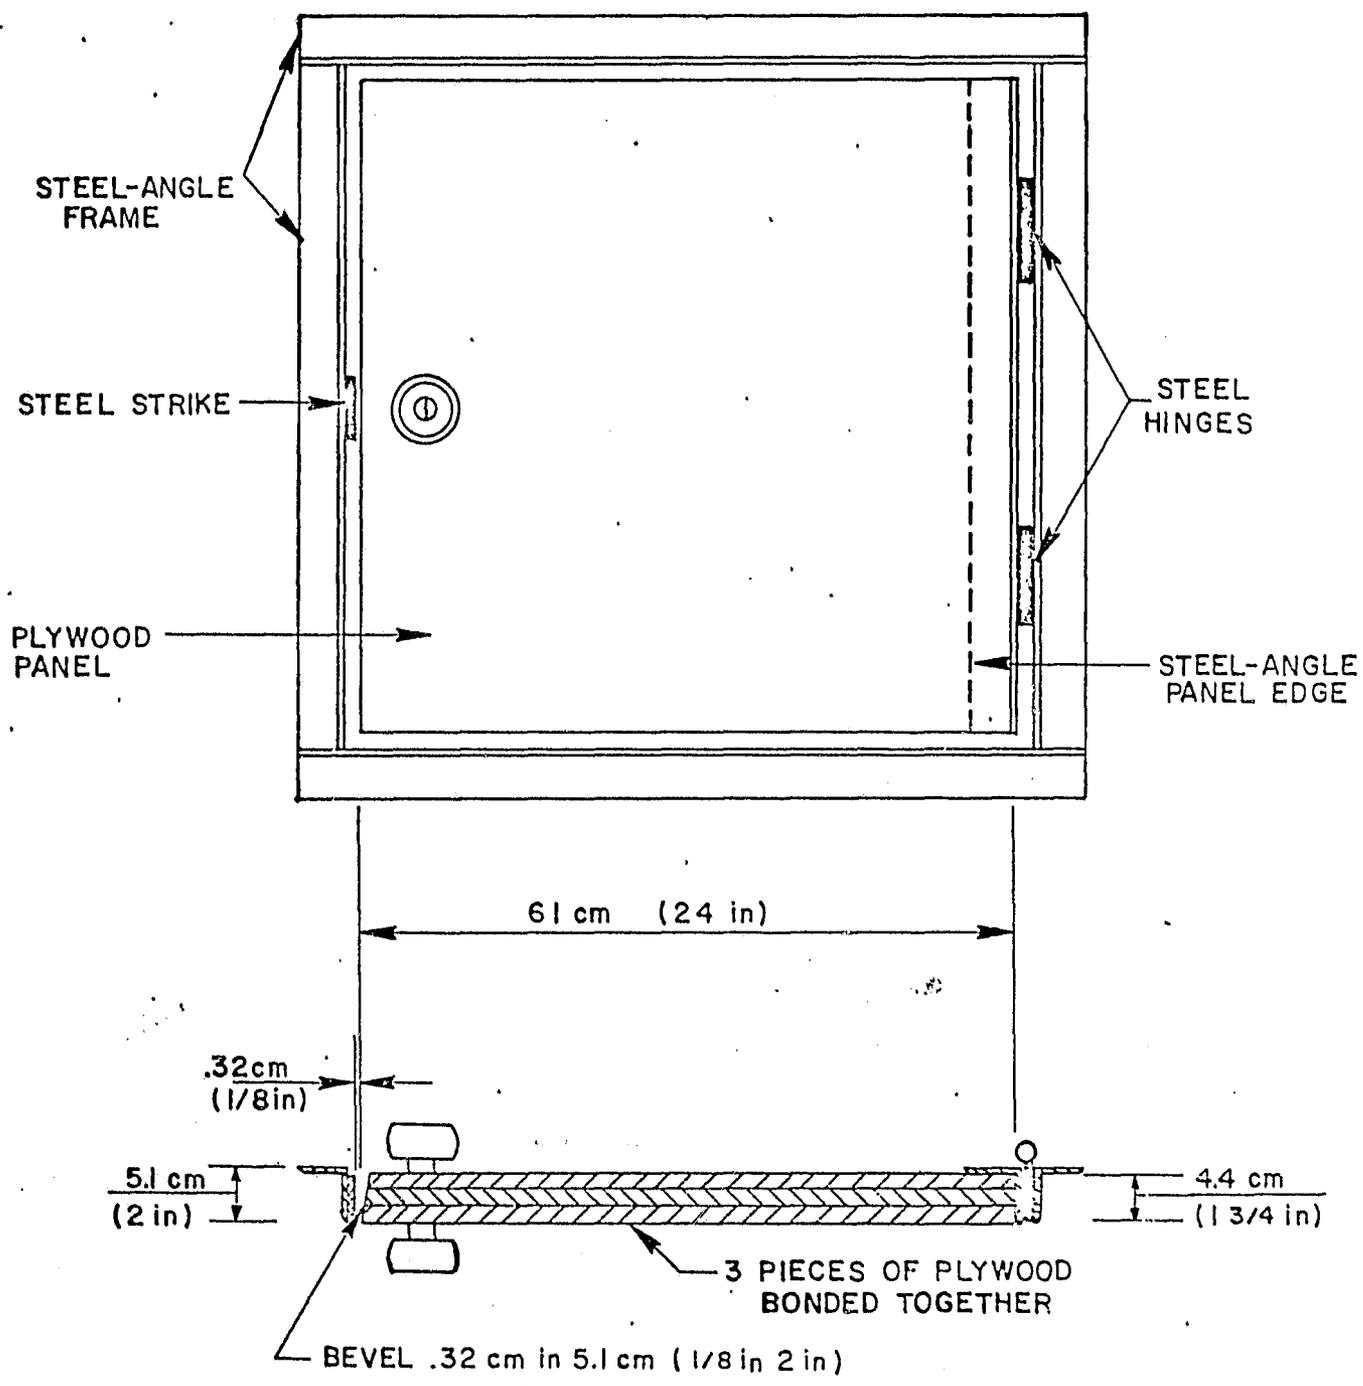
Door, Door Jamb, Hinge, and Lock Strike Component Fixture
